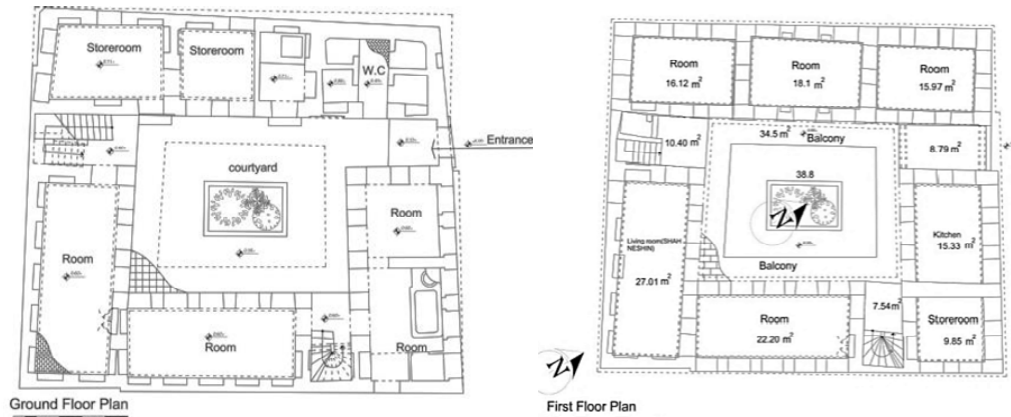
Plan of Rashidy mansion house (drawn by authors). The building land area is 324 square meters, and floors area is 570 square meters, and the building occupancy is 88%
